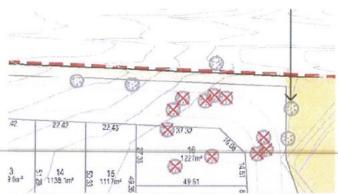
Detail of the Concept Plan where trees have been mapped as being retained but are within the 20m road and road verge area.
